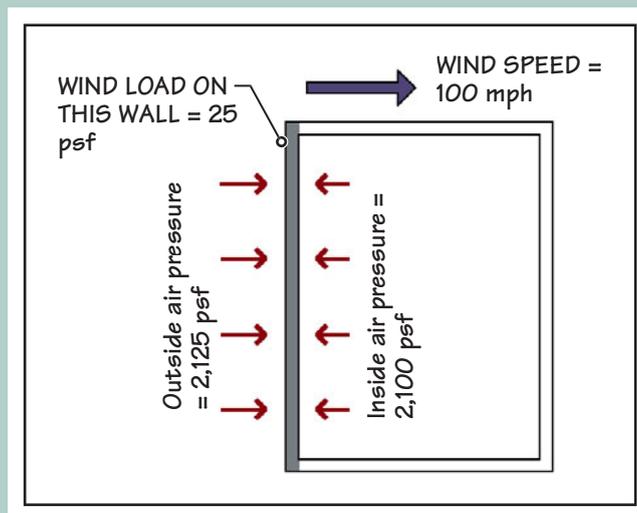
Outside and inside air pressures on a windward wall of a fully enclosed building.
